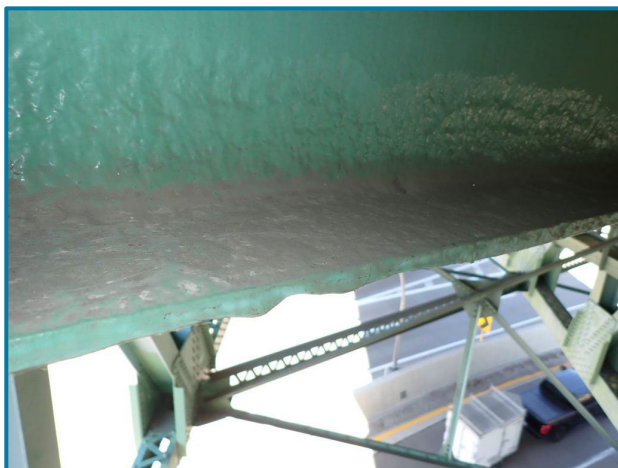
1/8" section loss across the bottom flange and lower web (over Pier 10 looking west).
